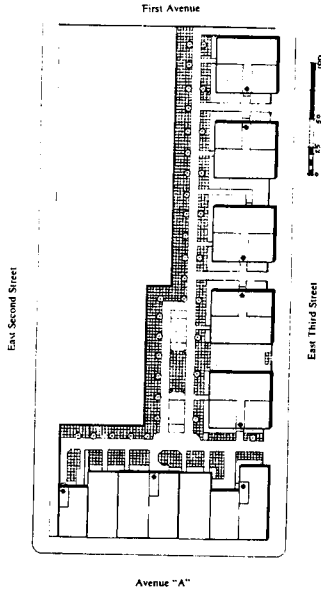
Site plan of First Houses. (Courtesy of New York City Housing Authority)
